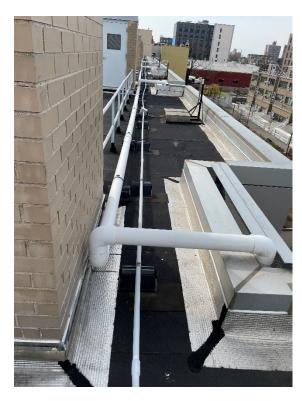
Looking south, photo showing SSDS piping run along the roof with legs heading down the residential side of the building.
